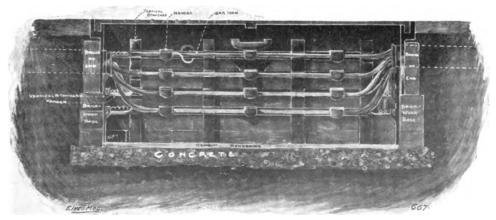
Sectional Elevation of Cable Supports for Joint-Boxes.
